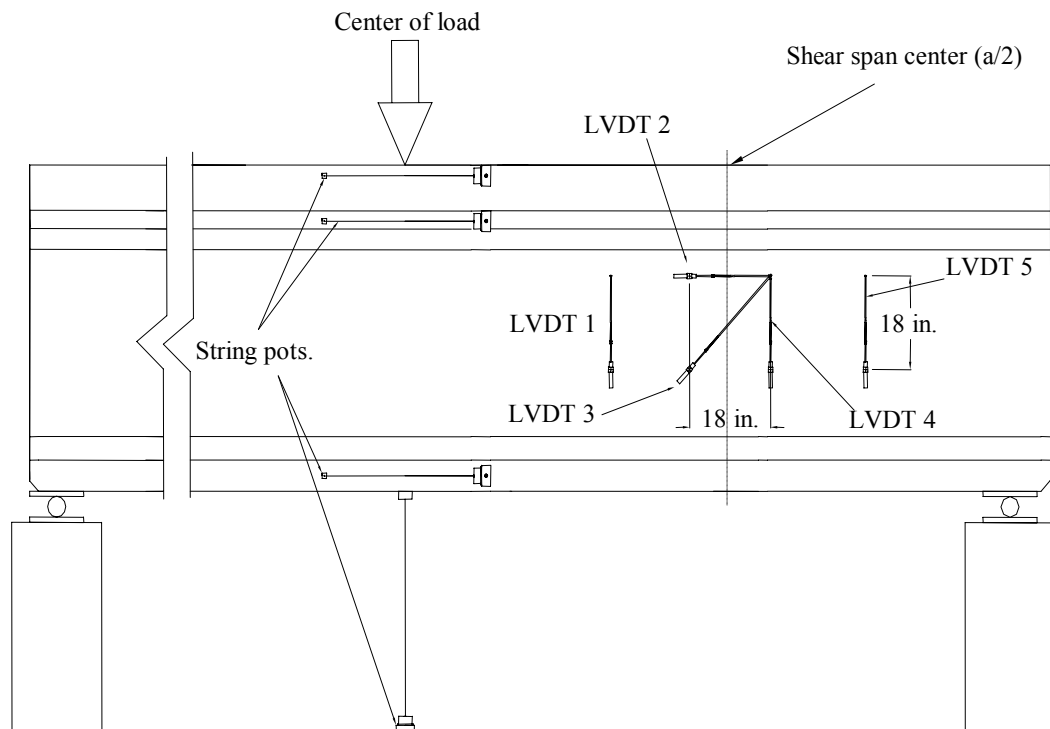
Typical LVDT and string potentiometer configuration (Test E-1 shown)
